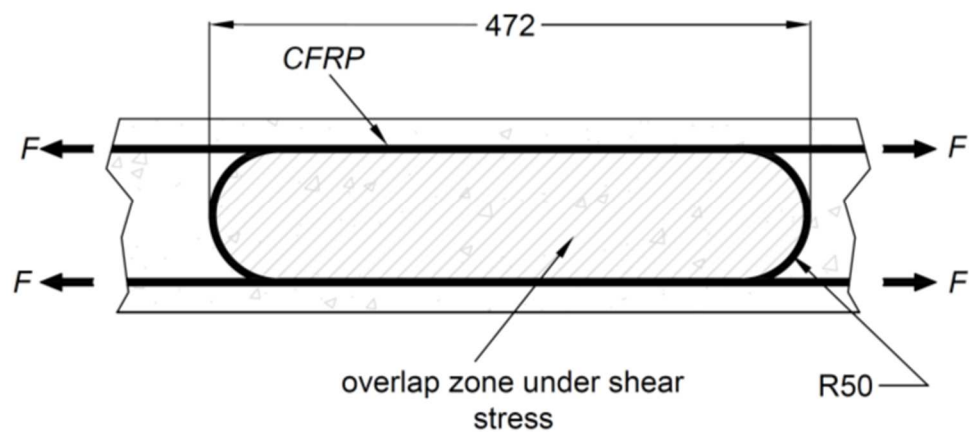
Areas of concrete affected by along-reinforcement shear force caused by CFRP loop (Beam specimen type E and F).
